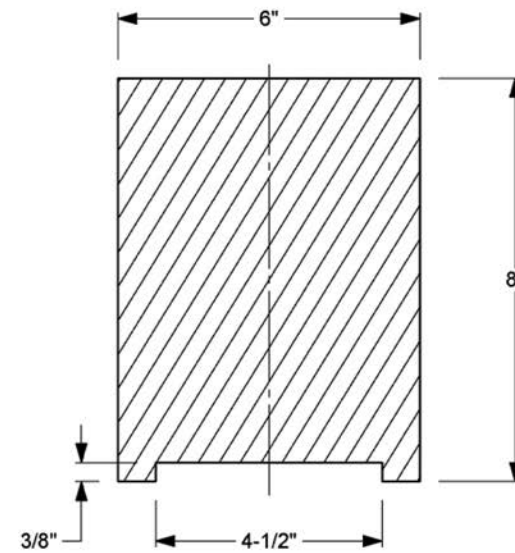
Tests 612941-02-3 and -4 guardrail post.
